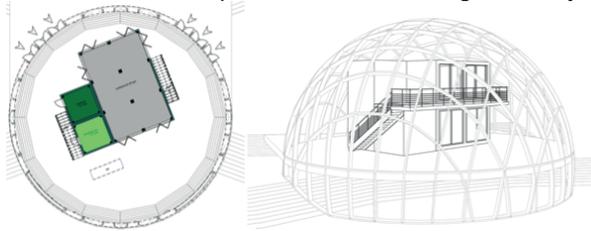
The Dome has a diameter of 16 metres (200 sqm built area) and in addition to the various open spaces offered inside the greenhouse, a wooden pavilion provides two meeting rooms. The floorplan on the left shows the larger meeting room on the ground floor ("Dome #3), above which the smaller room is located (Dome #2), seen on the perspective. The pavilion in the Dome was designed by the KTH architecture student Stefania Dinea, following a student competition in 2014.<sup>5</sup>
